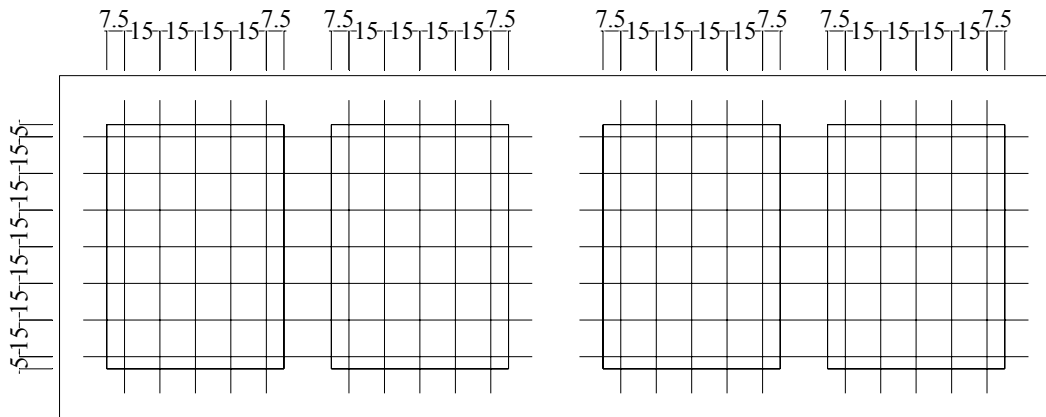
Reinforcement Details for Infill Wall (dimensions in cm)
